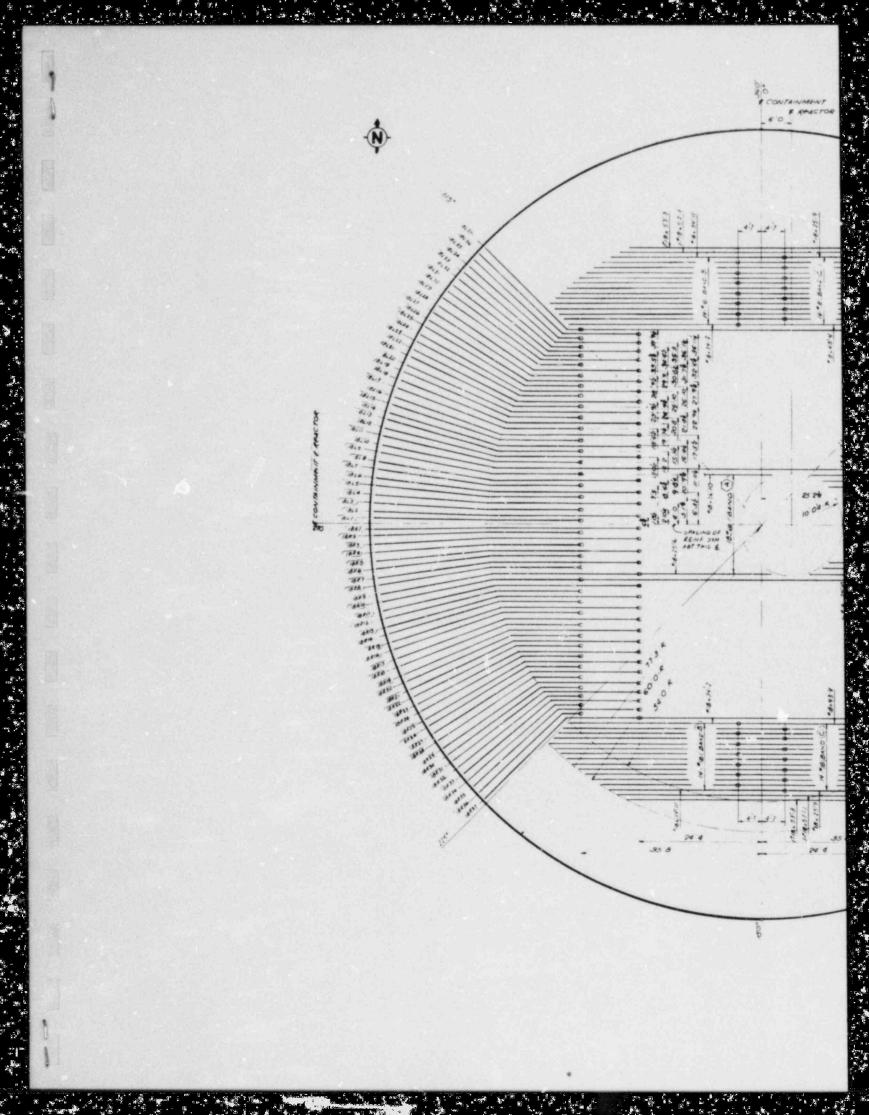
CONTAINMENT BASEMAT REINFORCEMENT TYPICAL N-S LAYGUT (UNIT 1) (Sheet 1 of 2)
